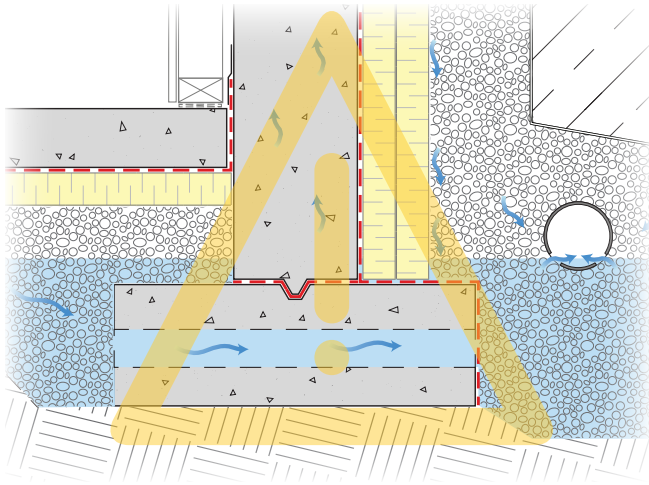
Poor practice: foundation drain pipe installed above the capillary break, potentially allowing the foundation wall to become wet resulting in rising damp.
